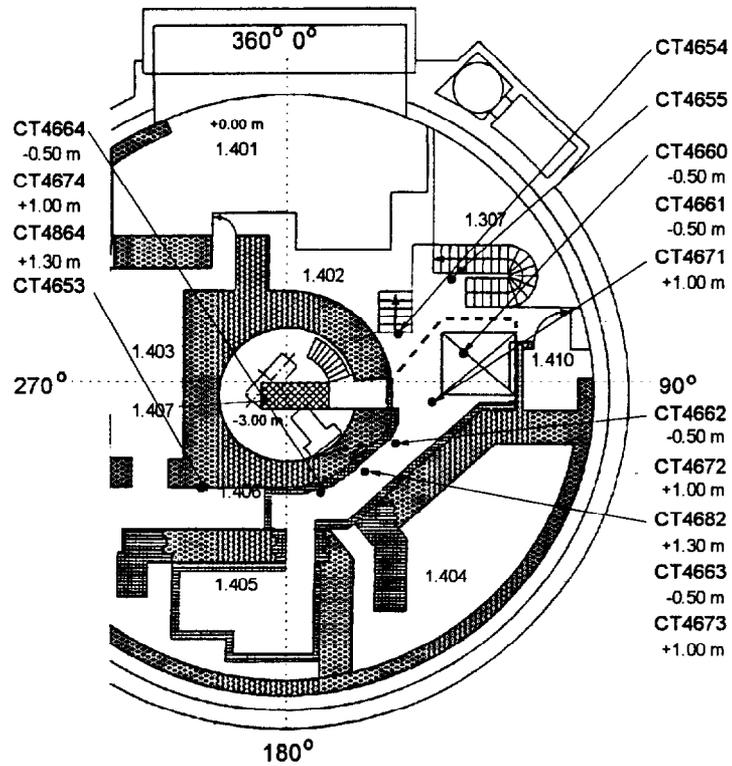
Level 1.400 TC's at the +0.0 m Elevation for T51.19
